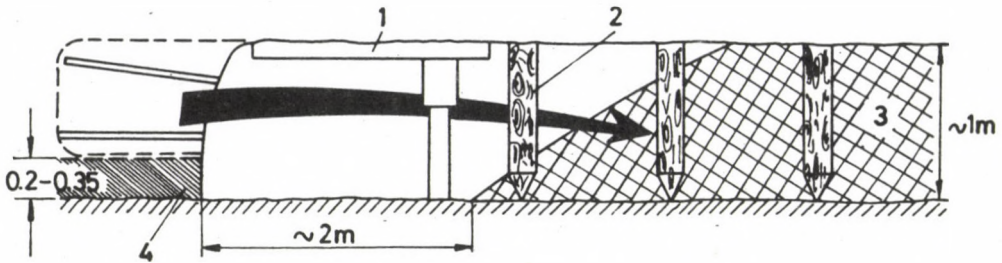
Schematic view of a face in copper mining. 1 - hydraulic prop, roof bar, 2 - wood prop, 3 - fitting, 4 - seam
